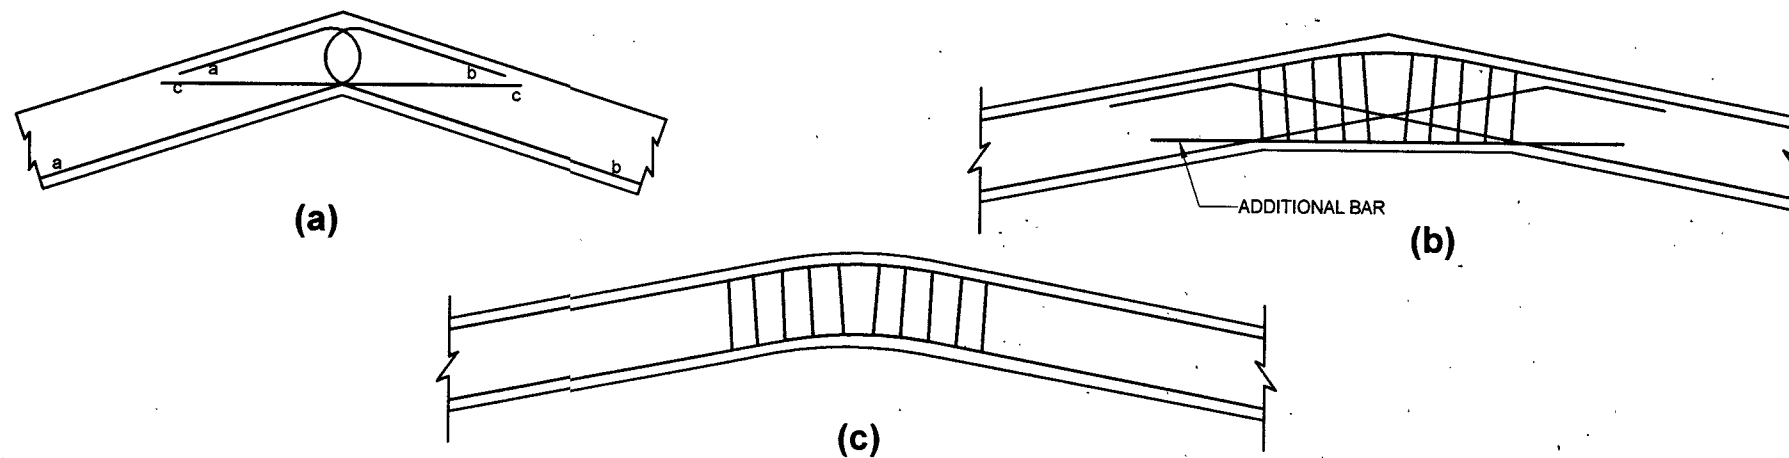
METHOD OF REINFORCEMENT DETAILING FOR CRANKED BEAMS
